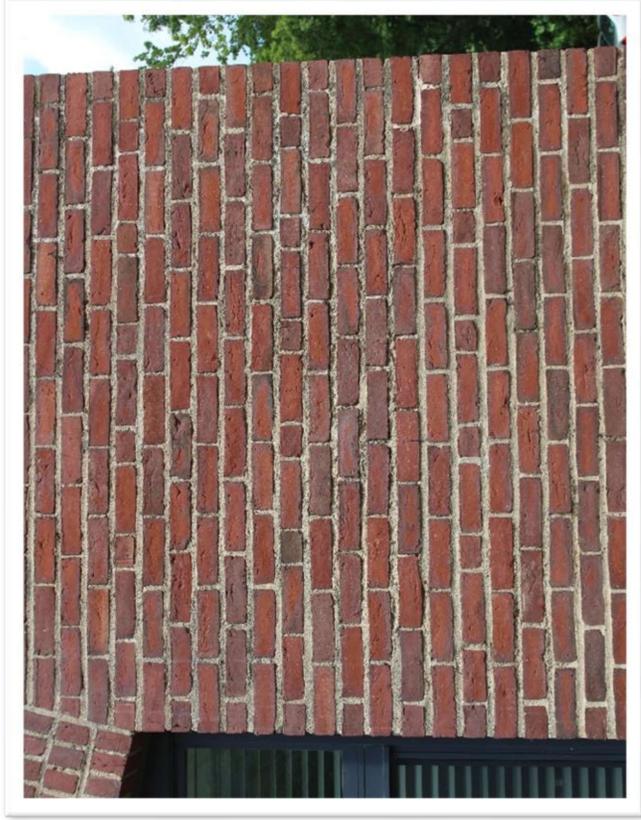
1920 brick masonry wall constructed of solid brick masonry.
